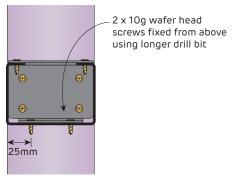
Header to Jamb Stud Connection for Prefabricated Door Frames
